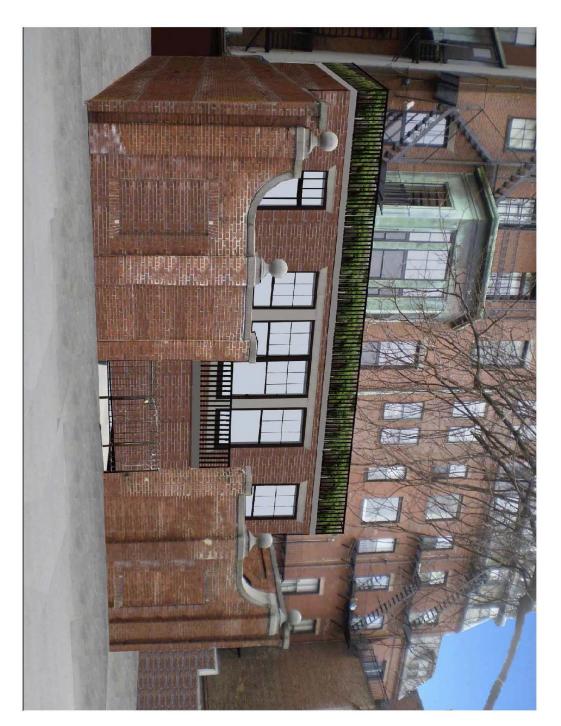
CARRIAGE HOUSE ADDITION SITE
